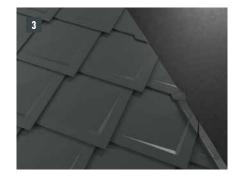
• Roof hatch - Special feature of 29×29 and 44×44 rhomboid roof tile
